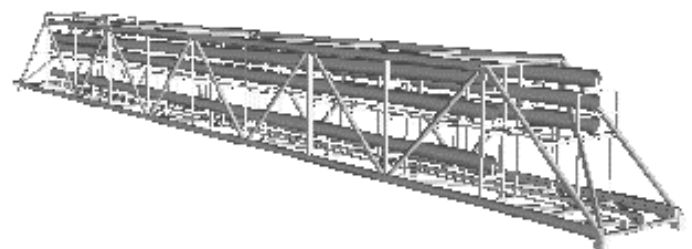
Bridge connecting two offshore oil platforms supporting hydrocarbon pipelines
